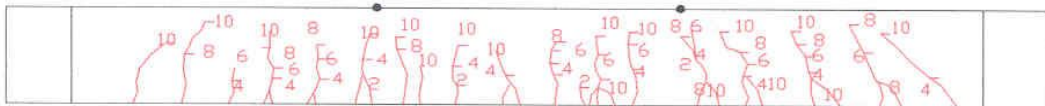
Delamination shear failure of 2-layers CFRP sheet
